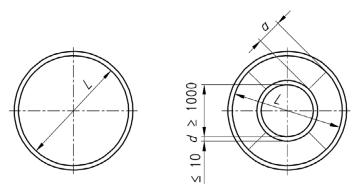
Subdivision of recessed ROBO®SLIDE L2 sheets for spherical sliding surfaces
